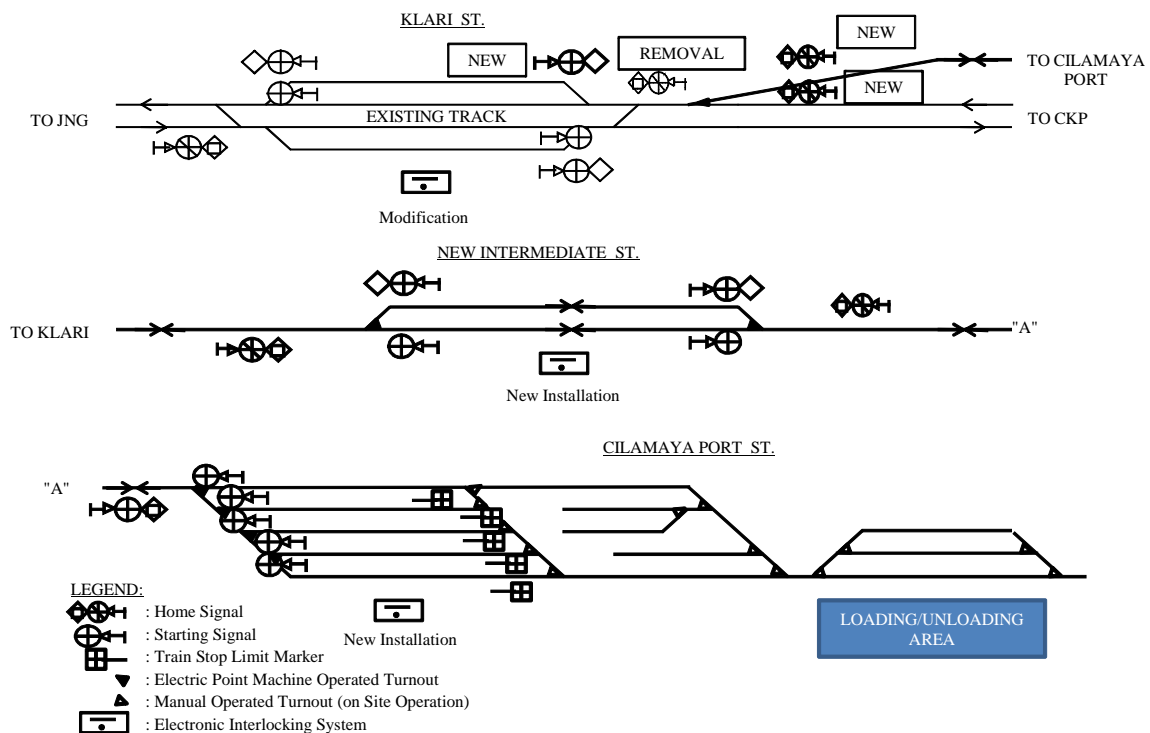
Signalling System Layout (Railway Access to Cilamaya New Terminal)
